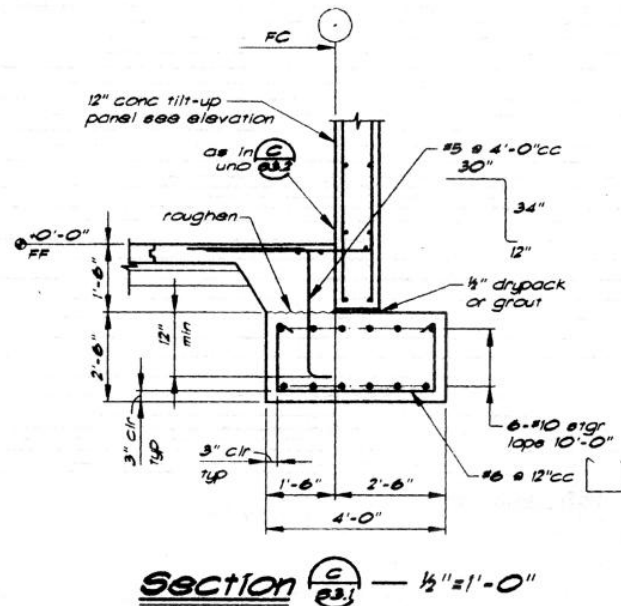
Footings are often depicted in wall sections on subsequent sheets, but in this instance the engineer is showing just a footing section, denoted C 33.1 on the plan in 8.5a.
